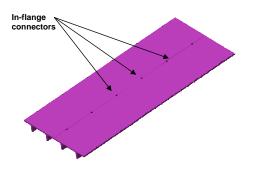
Schematic showing the location of flange connectors on adjacent typical concrete double-Tee beams.
